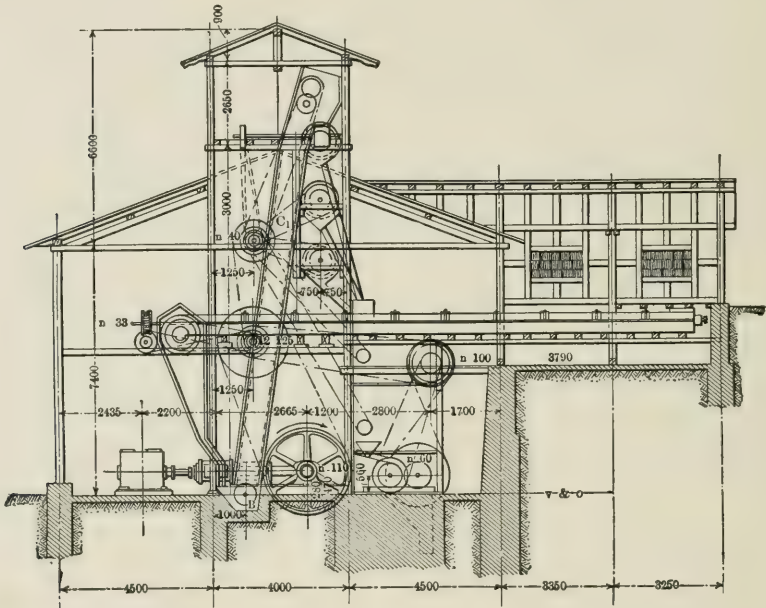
TRANSVERSE SECTION OF SEPARATION WORKS, NEUNKIRCHEN, GERMANY.
